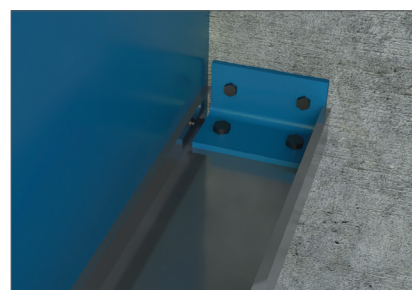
Detail of the longitudinal trimmer connection to a concrete element by means of an angle piece, which is fixed by bolts (chemical anchors or dowels)
